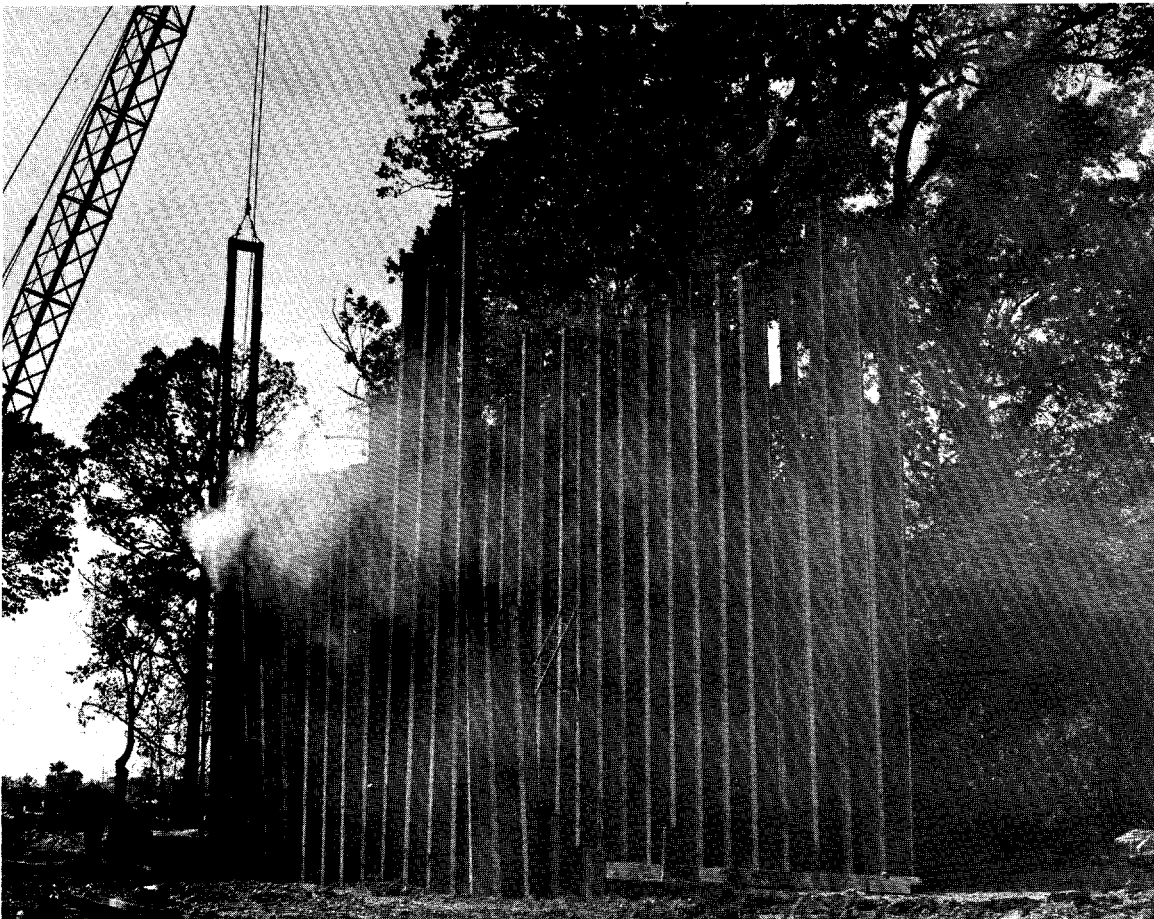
Sheet-piling work on the beginning of the Proton Laboratory.
